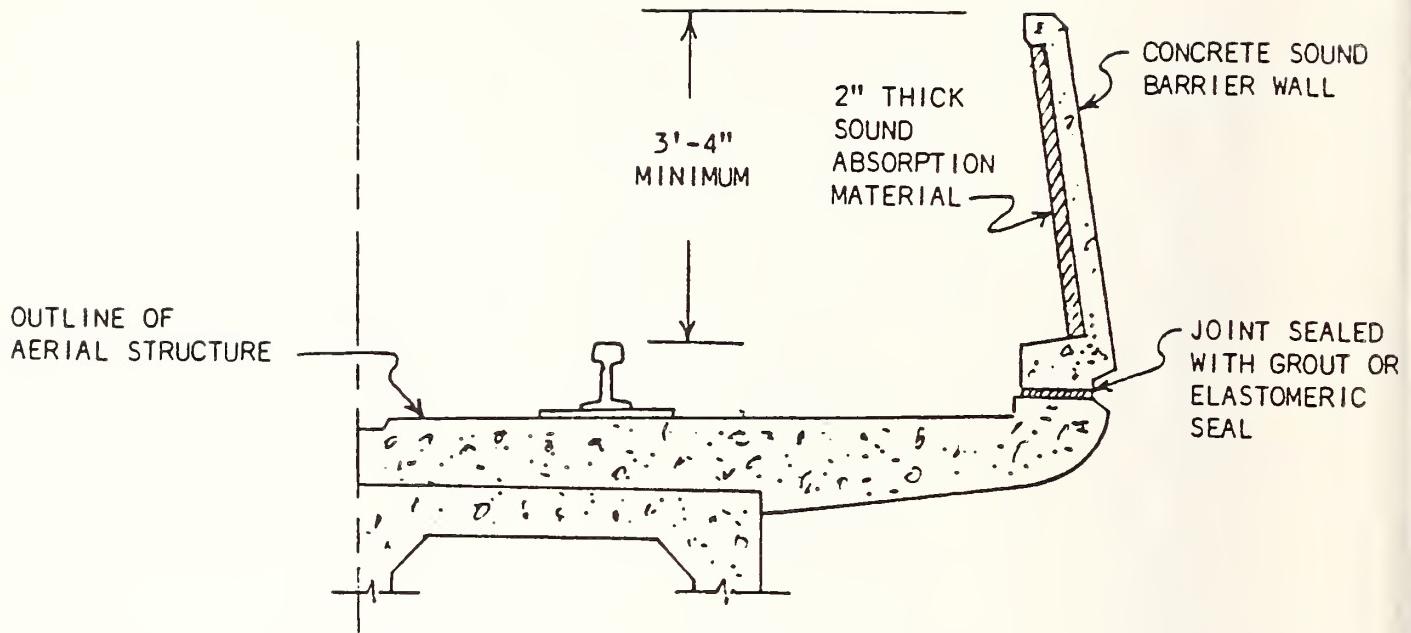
SOUND BARRIER WALL DESIGN USED ON WMATA METRO AERIAL STRUCTURES
